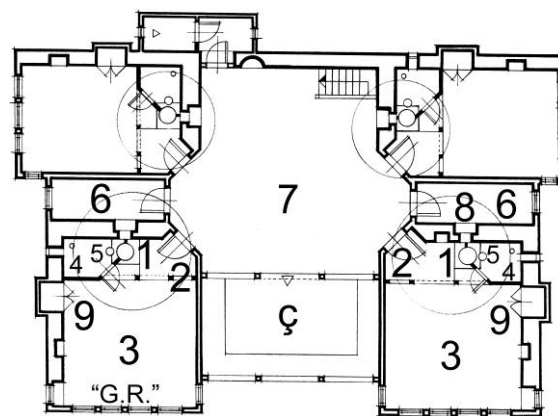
House floor plan [H-"A.a.GJ."], built in Prizren
